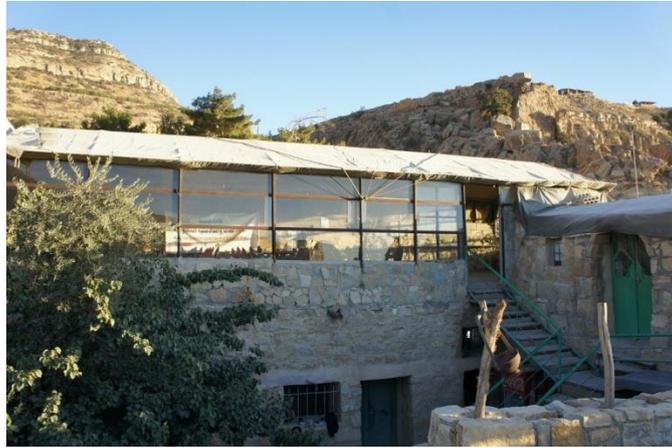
Additional floor on the southern part of the original Dana hotel (Author 2019)
